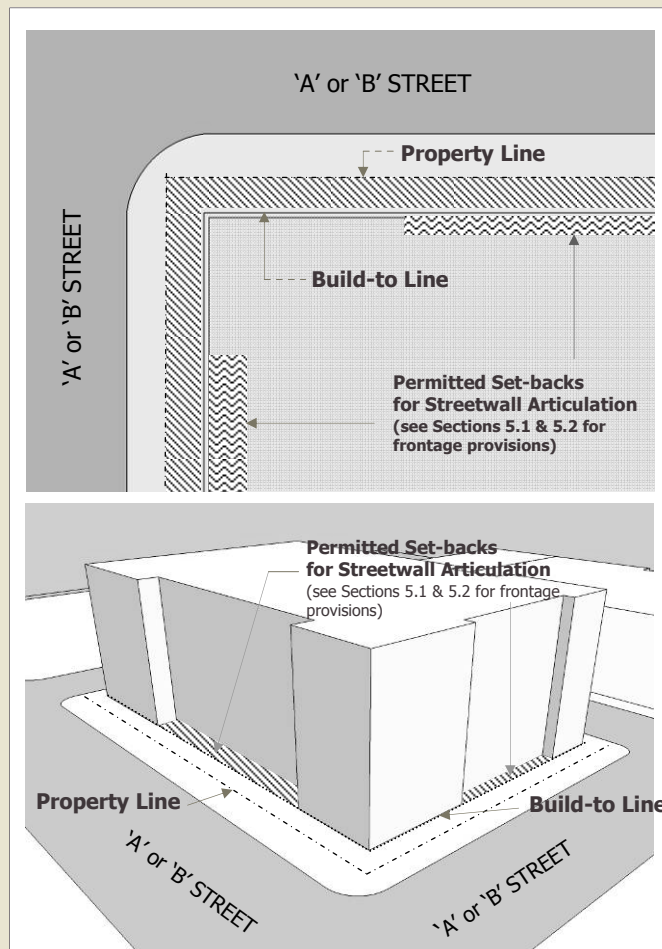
Development is located parallel to the street and placed at established build-to lines. Depending on the frontage type, the streetwall can stepback to accommodate façade articulation, in addition to patios and entrances.
